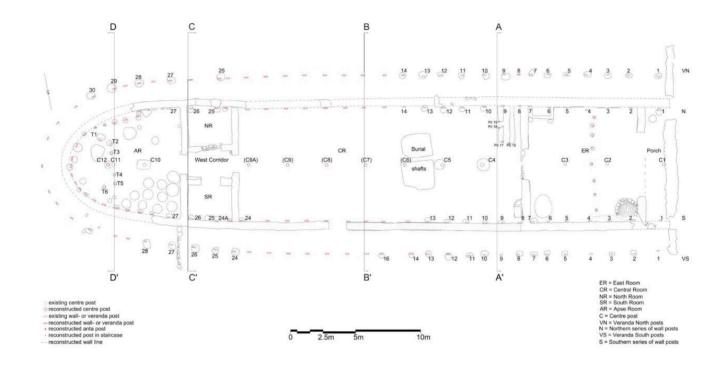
GENERAL PLAN OF THE LK-T BUILDING.
